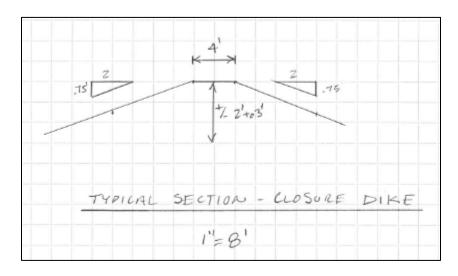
Engineer's sketch of a typical cross section of closure dike
